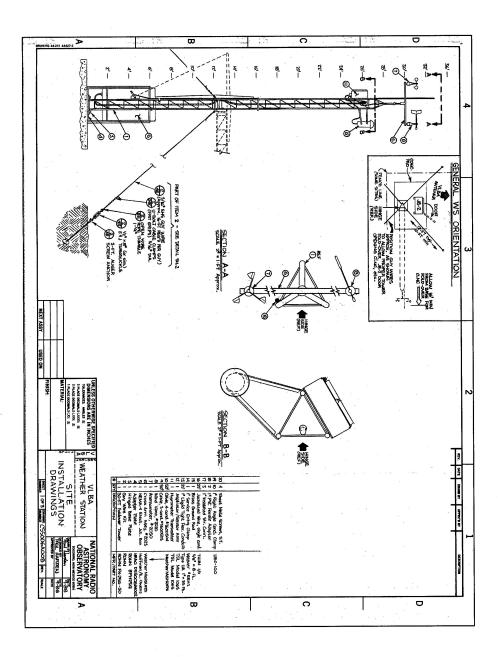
VLBA Weather Station Site Installation Drawings, C55006A008-1
